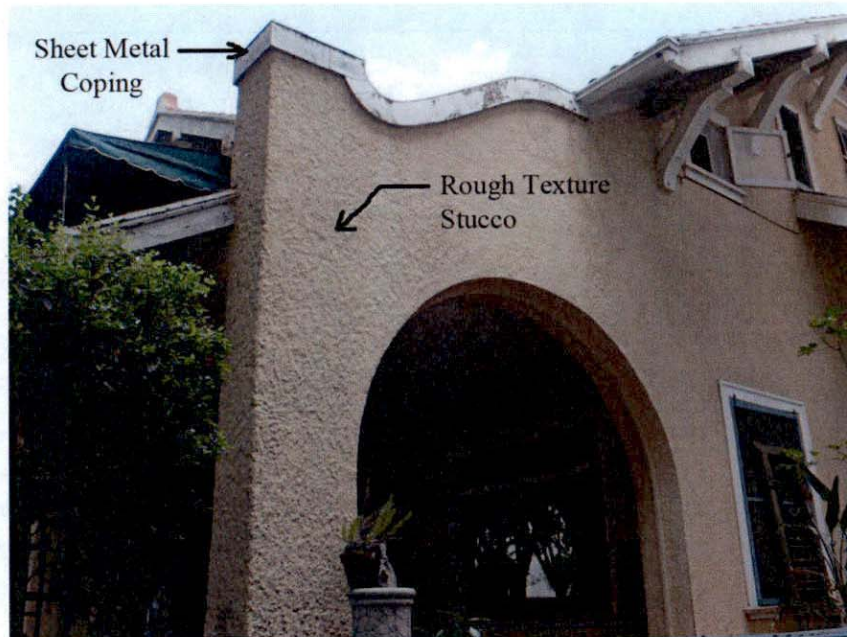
Looking west, within upper porch, at the sheet metal coping over parapet with a rough texture stucco wall surface.
